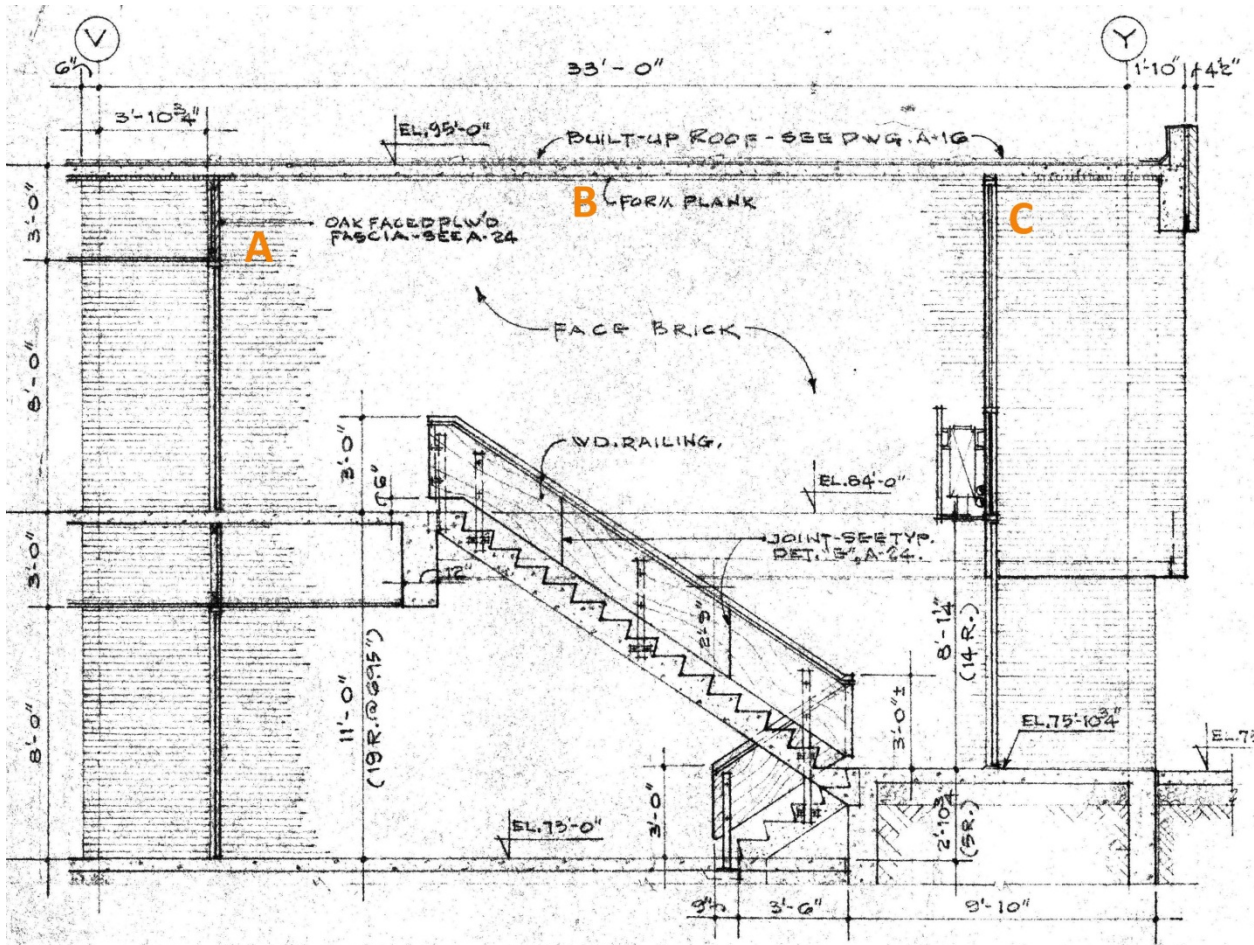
Section through typical stairway. A = plywood fascia above door to corridor; B = Tectum form plank; C = exterior entrance assembly. [From 1968 Drawing A-23, Section 'A-A'.]
